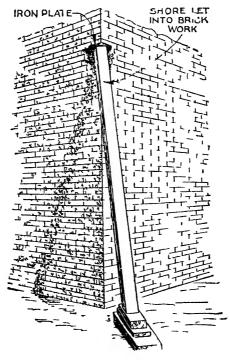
,605 —Outside shore let into brick wall to secure footing. Note plate which transmits the threst from shore to the brick work
